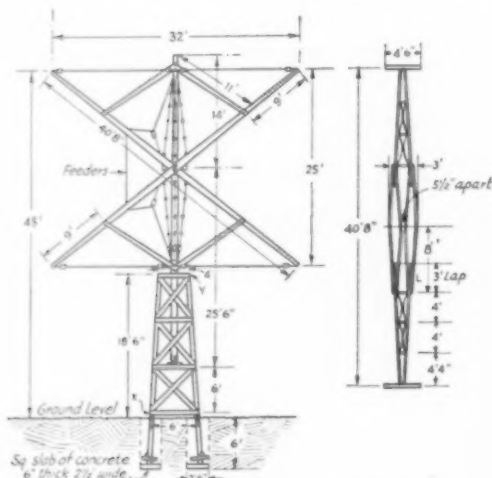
GENERAL PLAN OF THE TOWER, MAST AND CROSSARMS
